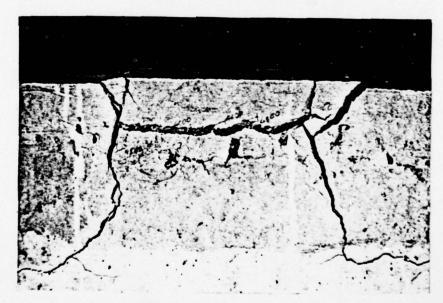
The beam continues to deform with the PCC material in the splice zone visibly lifting from the beam. Note the extension of the vertical cracking from the splice zone to the compression steel.
